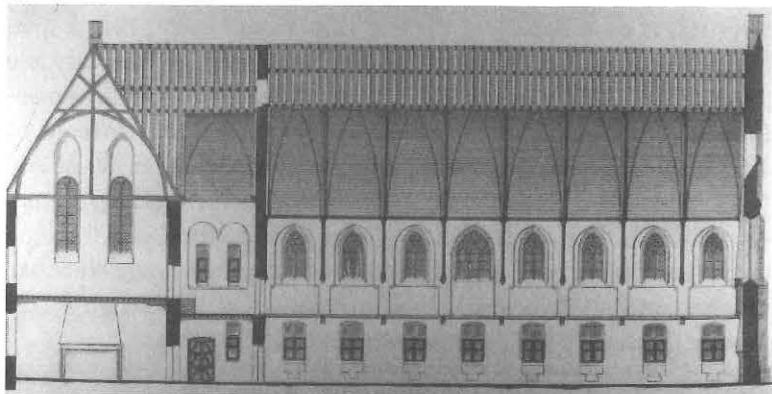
East and south ranges of the Bijloke at Ghent. Section of the refectory and cross-section of the dormitory (Drawing E. Serrure, 1881)
